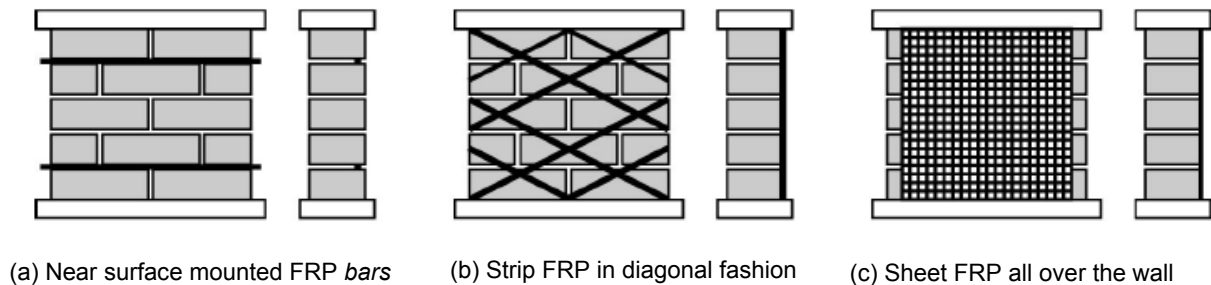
Different techniques of FRP installation on masonry wall (Stratford et al. 2004)
